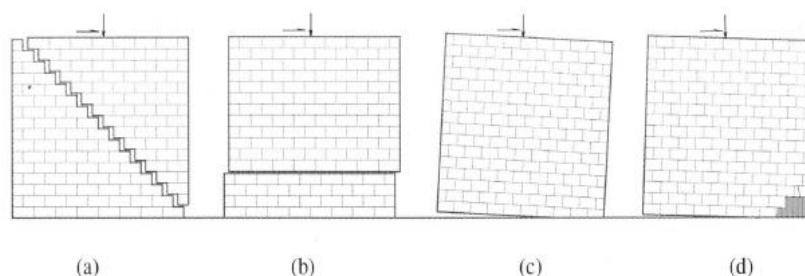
Major in-plane failure modes of URM walls: shear failure or diagonal tension cracking (a), bed joint sliding failure (b), rocking failure (c), and toe-crushing failure (d) (Elgawady & Lestuzzi, 2004)
